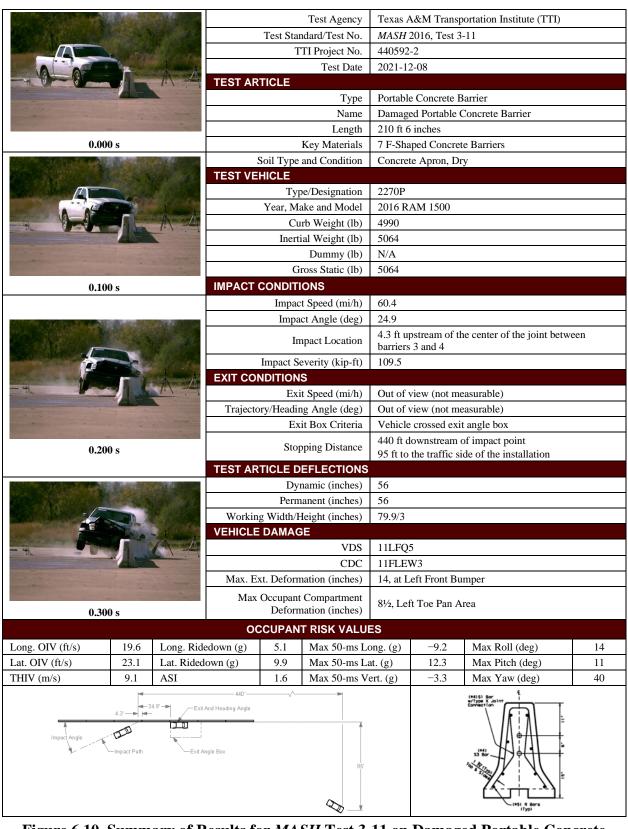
Summary of Results for *MASH* Test 3-11 on Damaged Portable Concrete Barriers, Test No. 440592-2.
